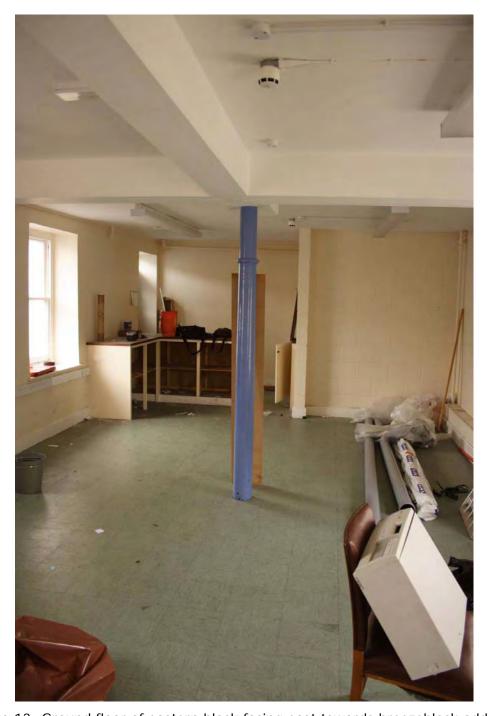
Ground floor of eastern block facing east towards breezeblock addition
